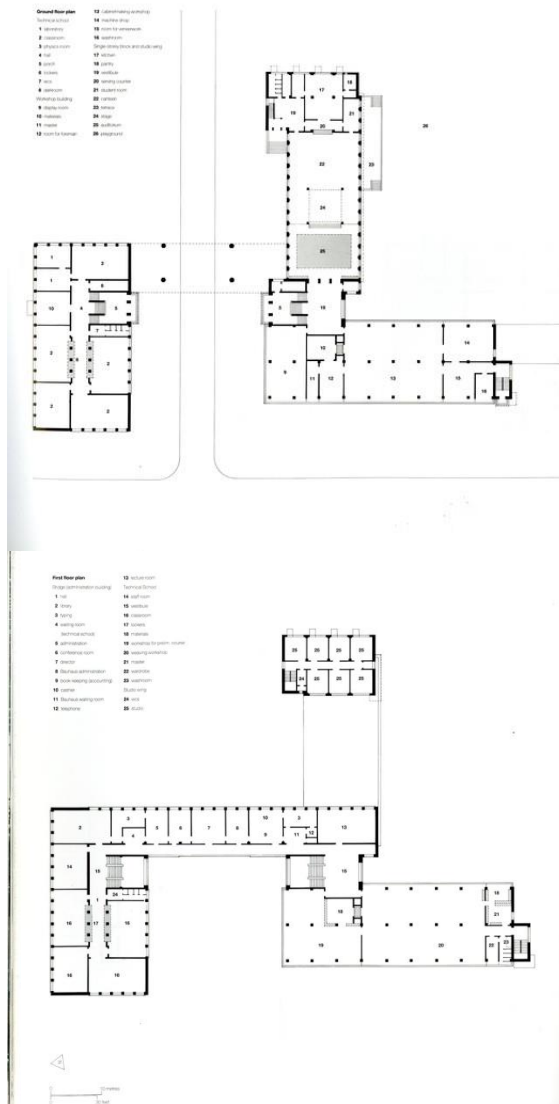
Dessau Bauhaus ground floor plan (left) second floor plan (right) (URL2)
